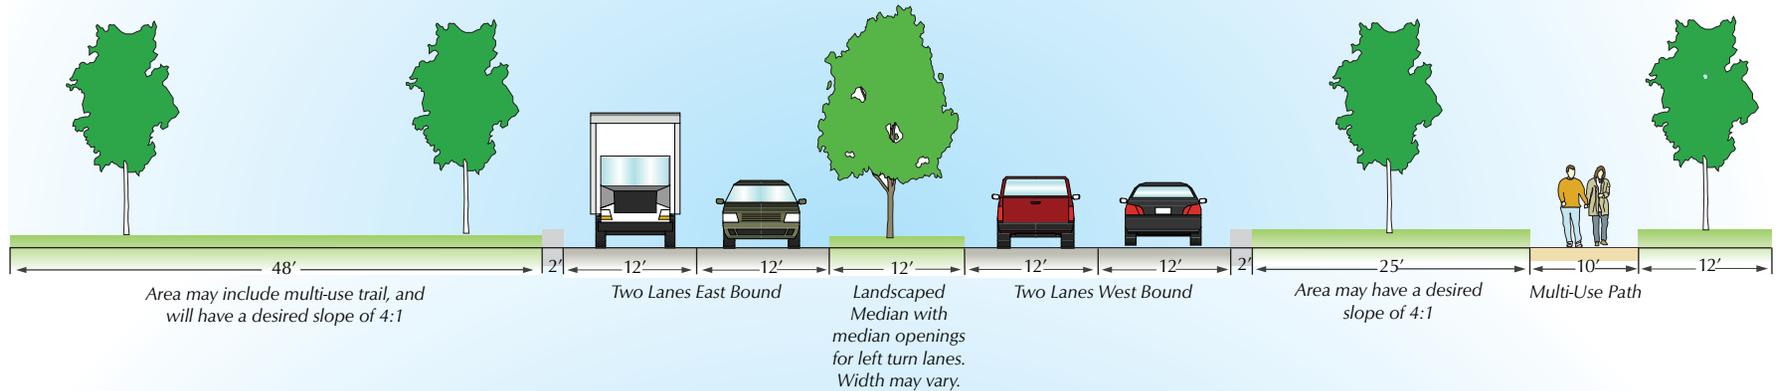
CROSS-SECTIONS TYPICAL ROADWAY CROSS-SECTIONS
